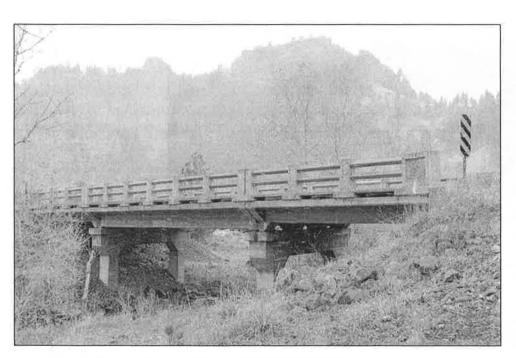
Prewett Creek Bridge (24CA0642) profile. View to the southeast.
